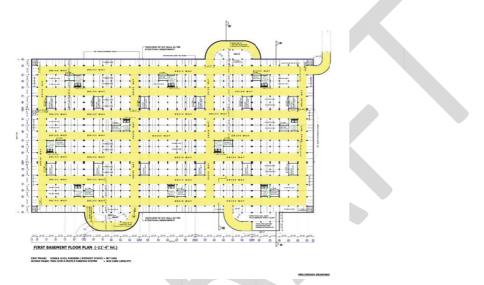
First underground floor plan © Department of Urban Planning, U.T. Chandigarh
